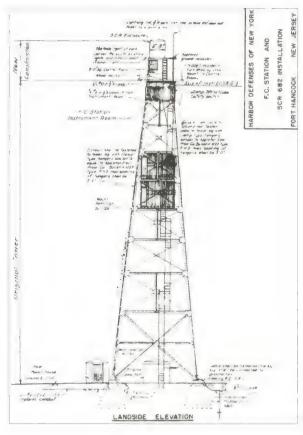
Elevation of SCR-682 radar installation, 1944. One of the radar installations at Sandy Hook added a SCR-682 radar unit to the top of an existing fire control tower originally constructed in the late 1920s for Battery Harris. (Report of Completed Works, CDSG ePress).
